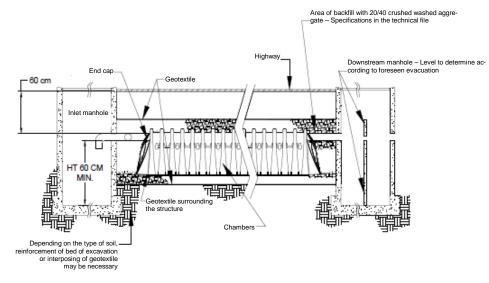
Cross section of inlet and outlet – Example of STORMTECH SC740 or SC310 chambers.
